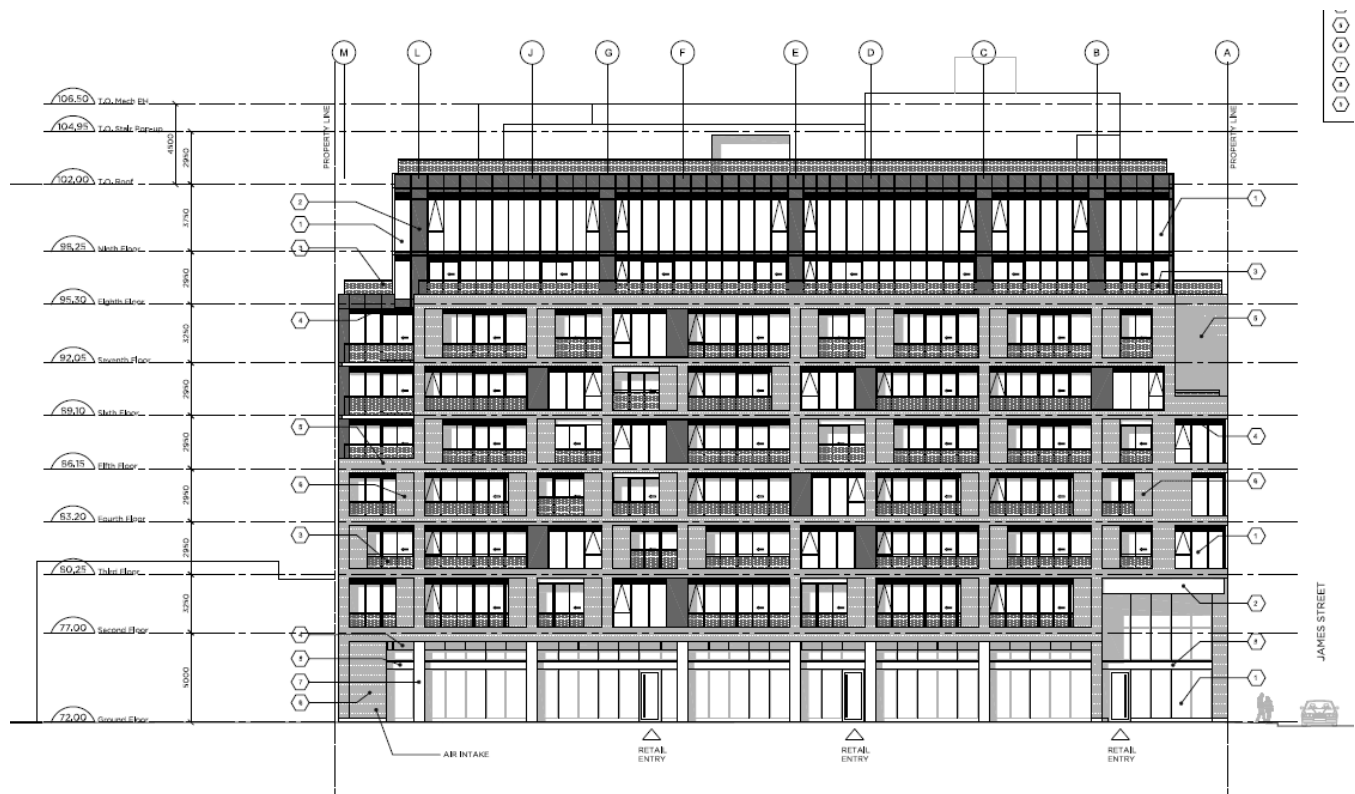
Elevations of the proposed building looking west from Waverley Street.
